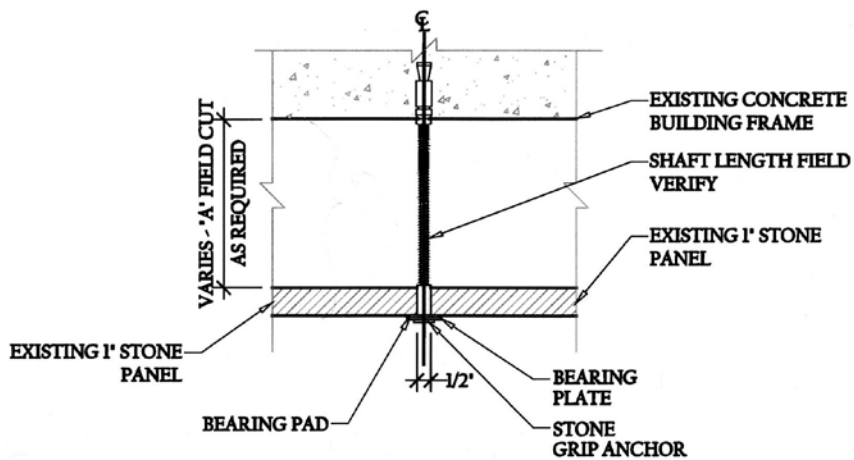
Detail for ceiling anchors (1 in. = 25 mm)
